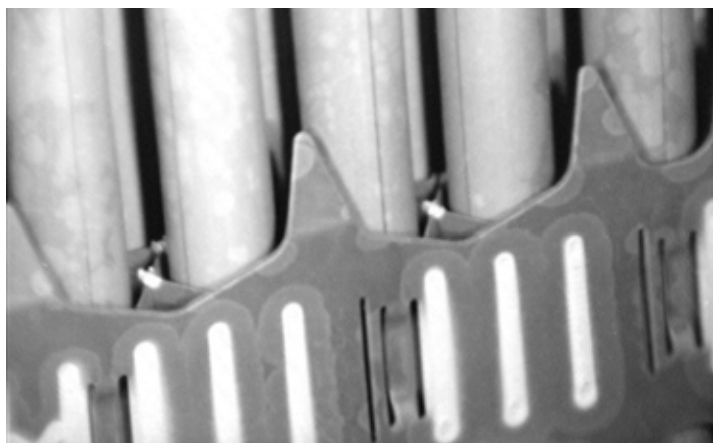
Condition of Zr1%Nb grid 14 weld joints, WLTA AA03-03, face 1, inspection 2010.
